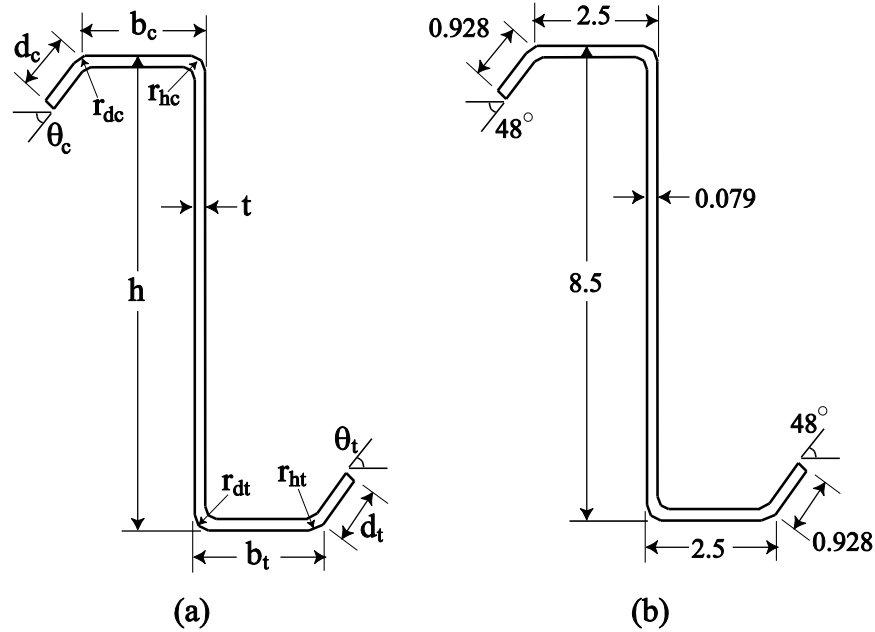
(a) Cross-section dimension notation and (b) nominal dimensions (in.).
